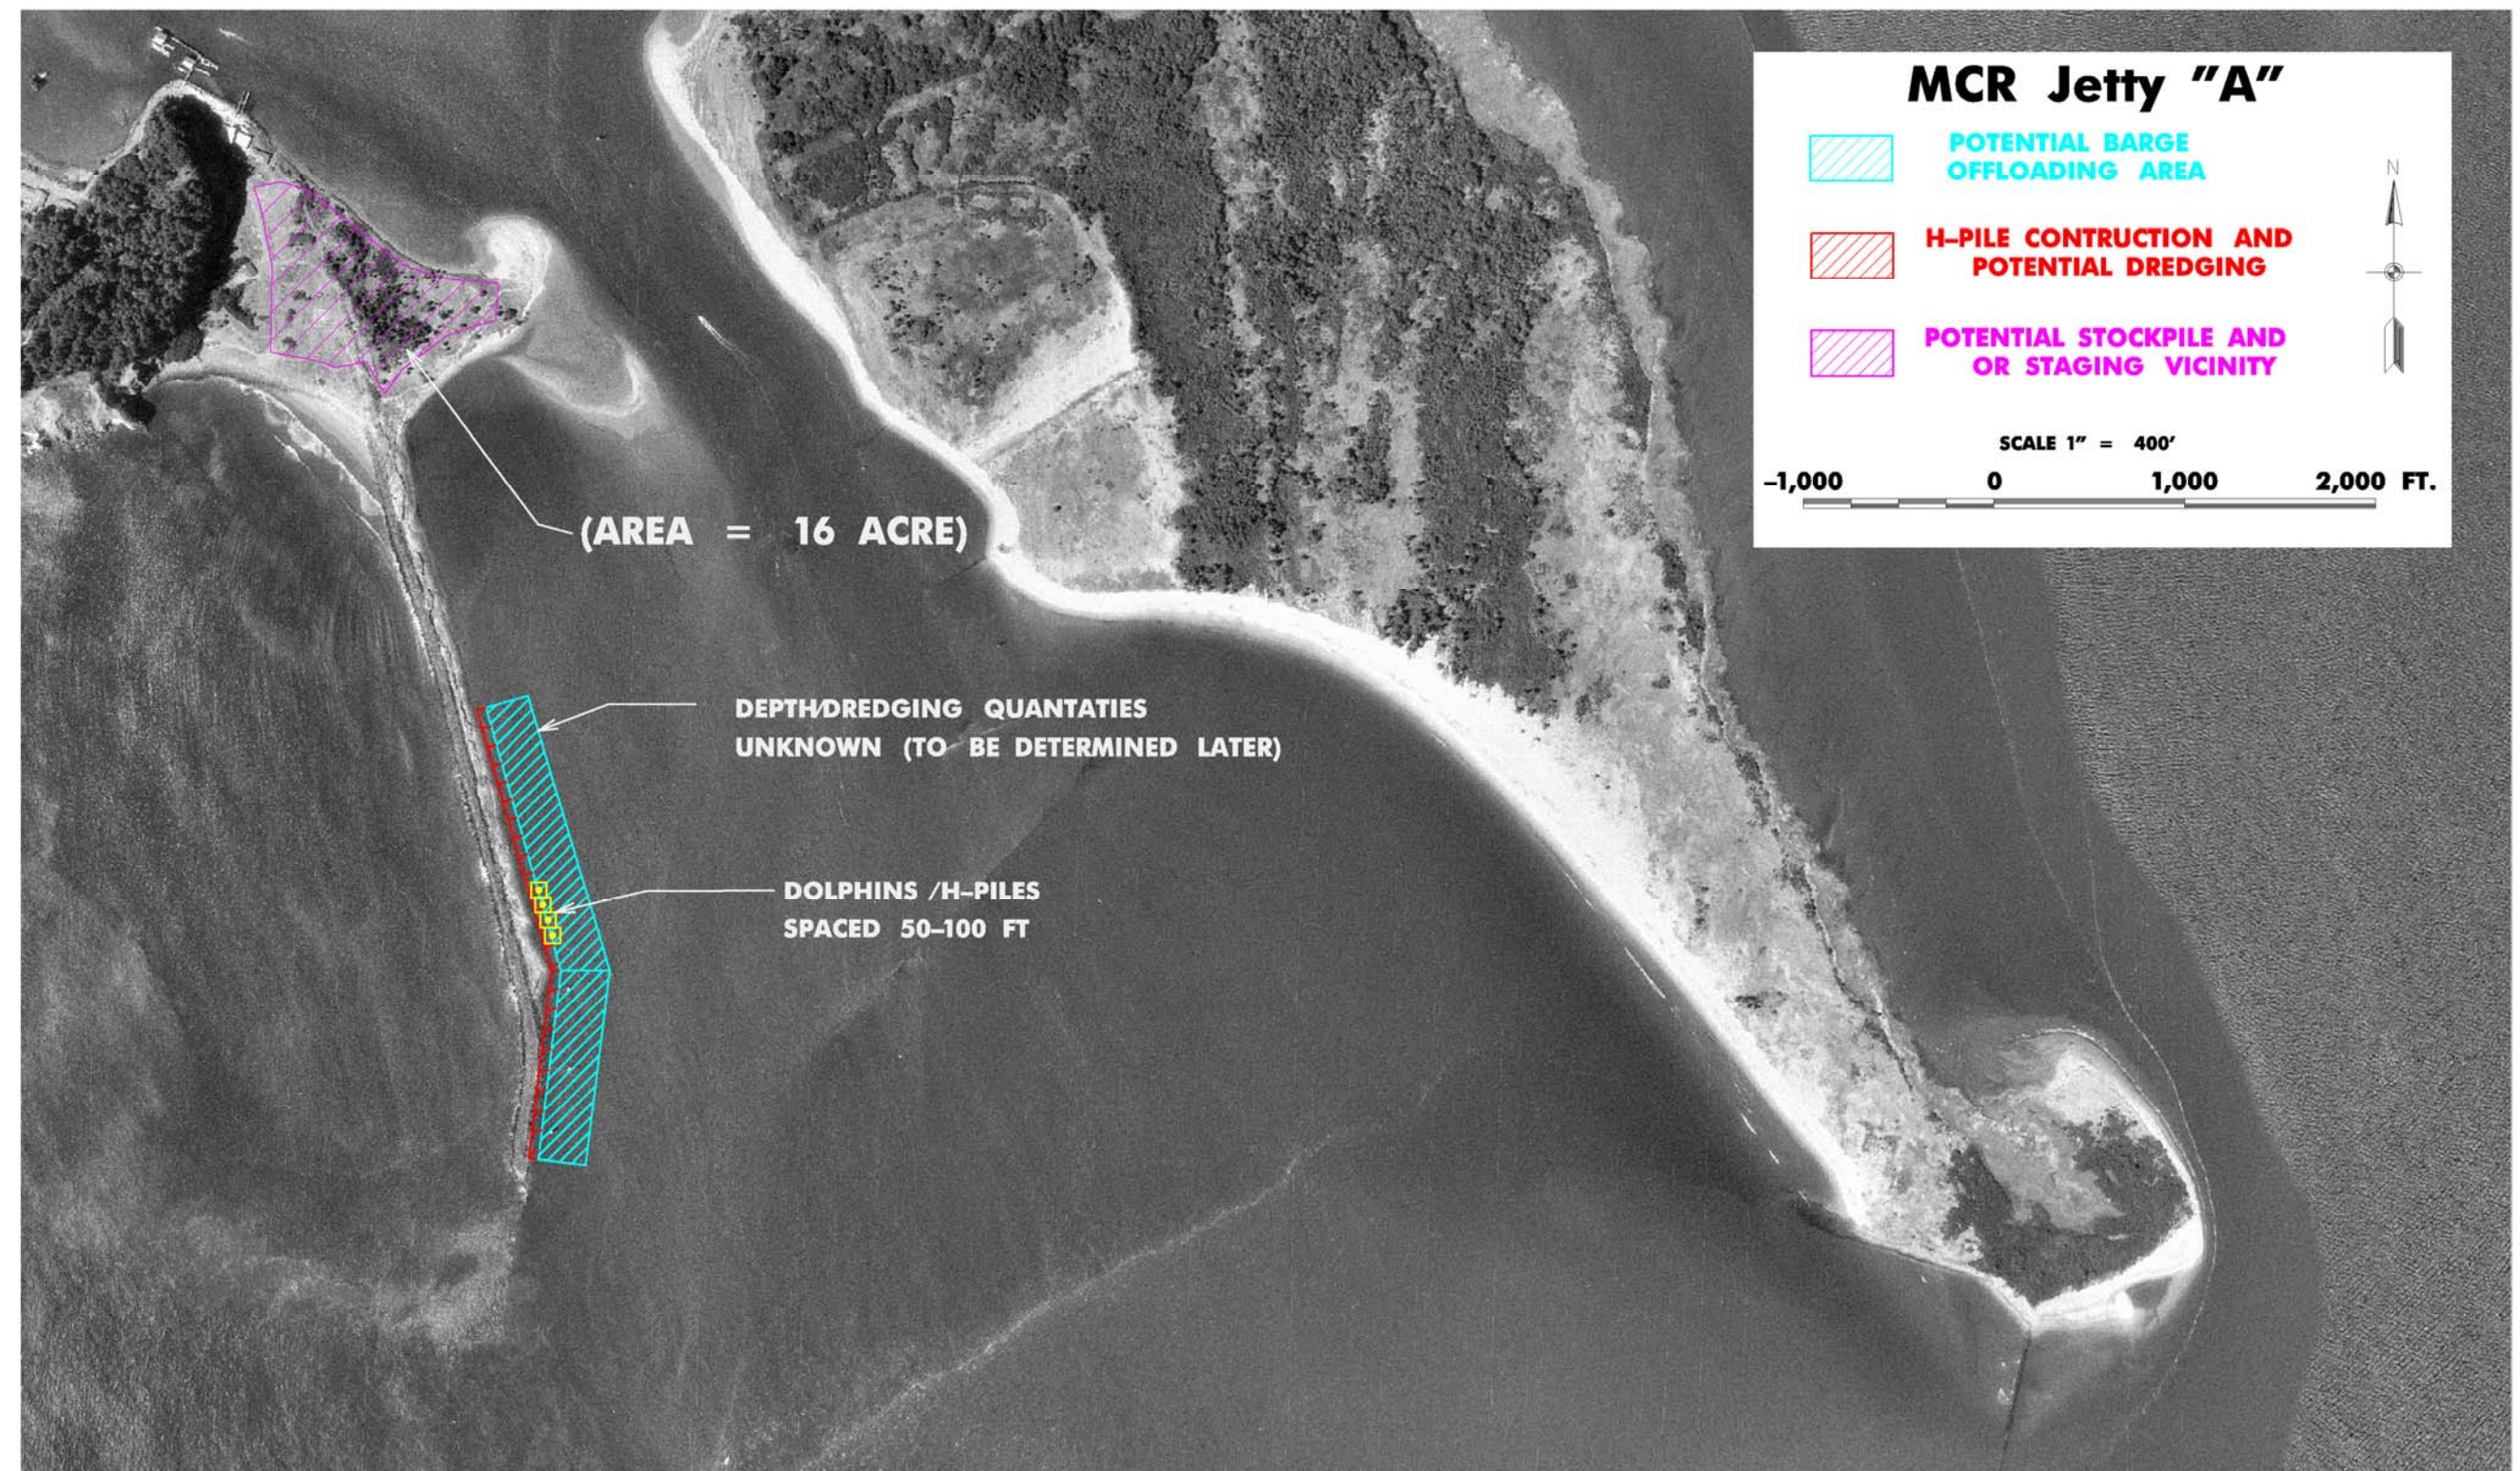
Potential offloading, dredging, piling, stockpiling/staging areas located near the MCR north jetty
